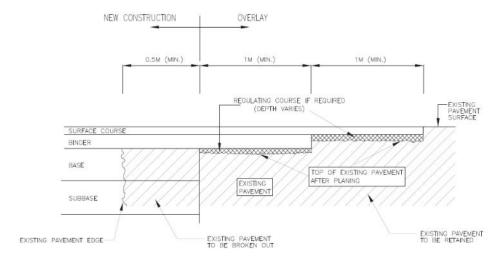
Transversal Joint between new construction and existing road as per CC-SCD-00704-03
